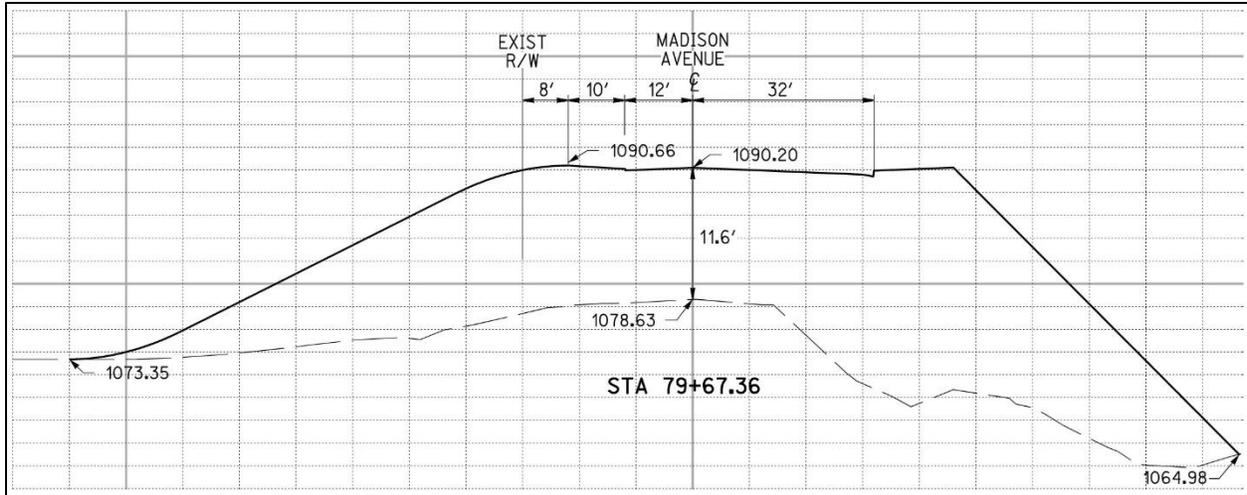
Cross-Section in Location of Maximum Fill Slope
